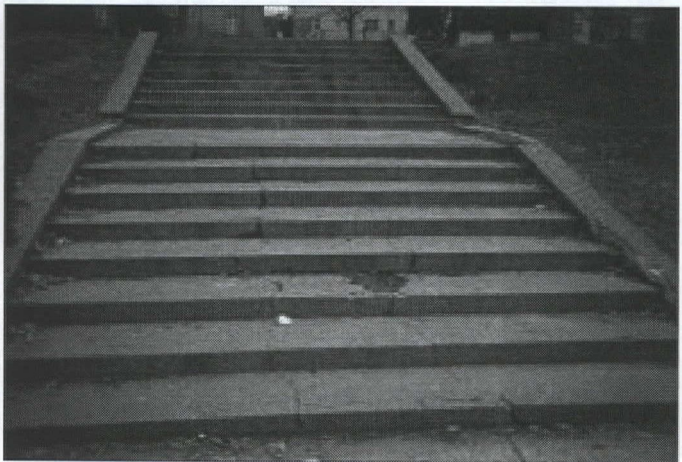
Entering the northwest corner of the park from 16th Street. Note that some of the concrete risers are cracked and damaged, 1997, see plan sheet 34 (Land Ethics, Inc.).
